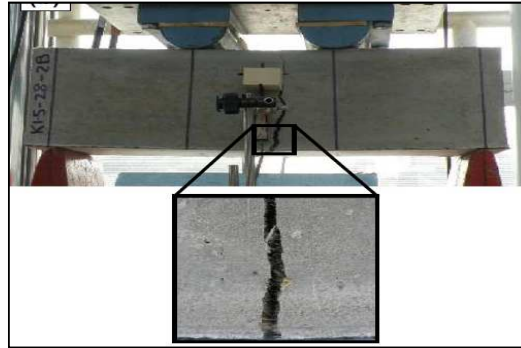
Cracking Failure mode of Kenaf fibrous reinforced concrete
